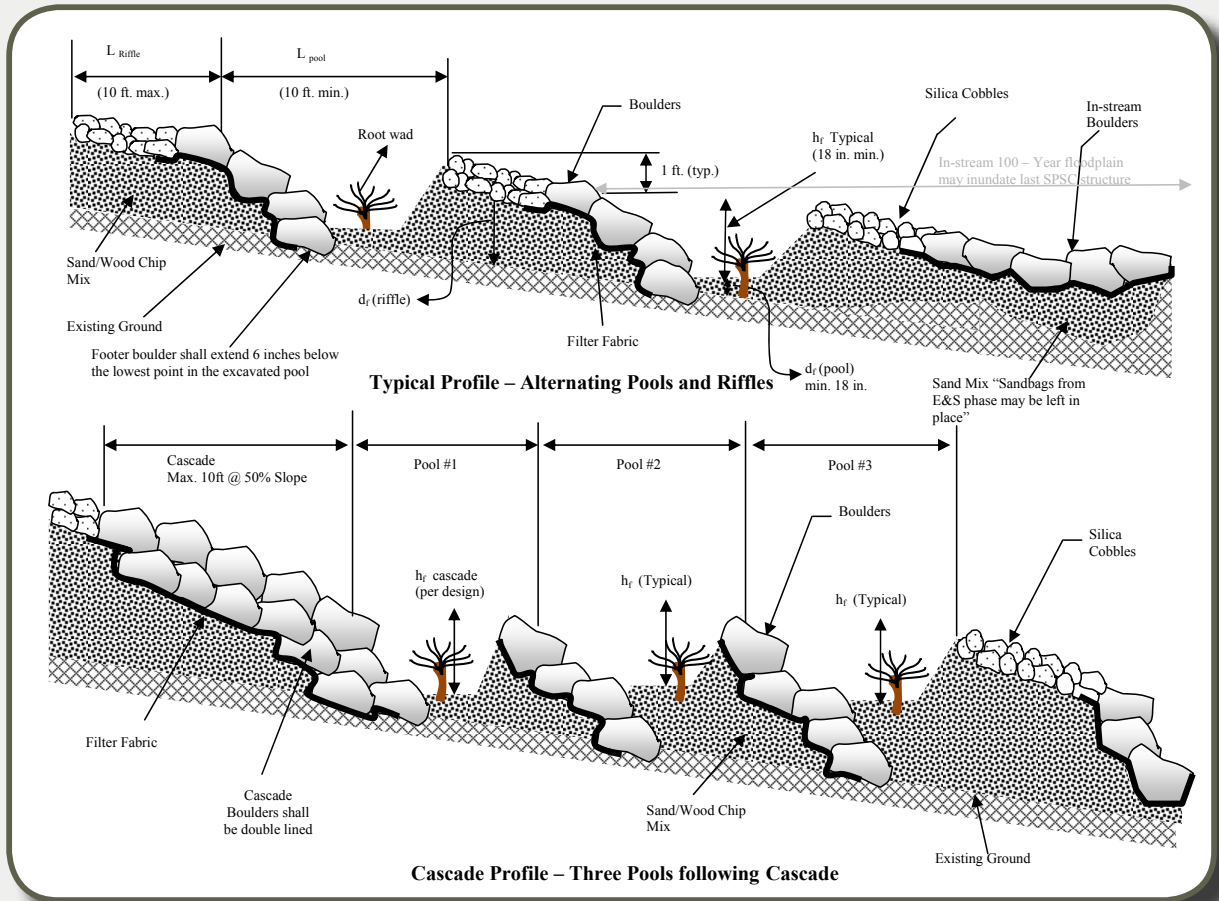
Typical Profile of Alternating Pools and Riffles (top) and Three Pools following Cascade (bottom) (Source: Anne Arundel County, 2011).
